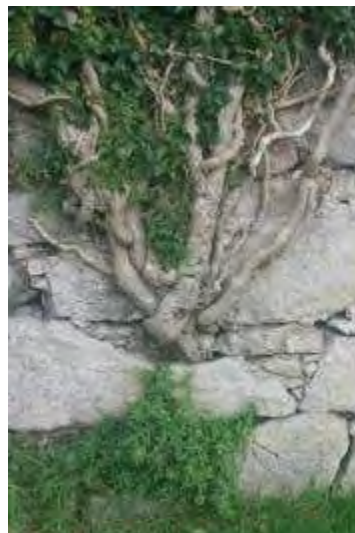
Ivy rooted in the wall, not the ground, is always damaging.
